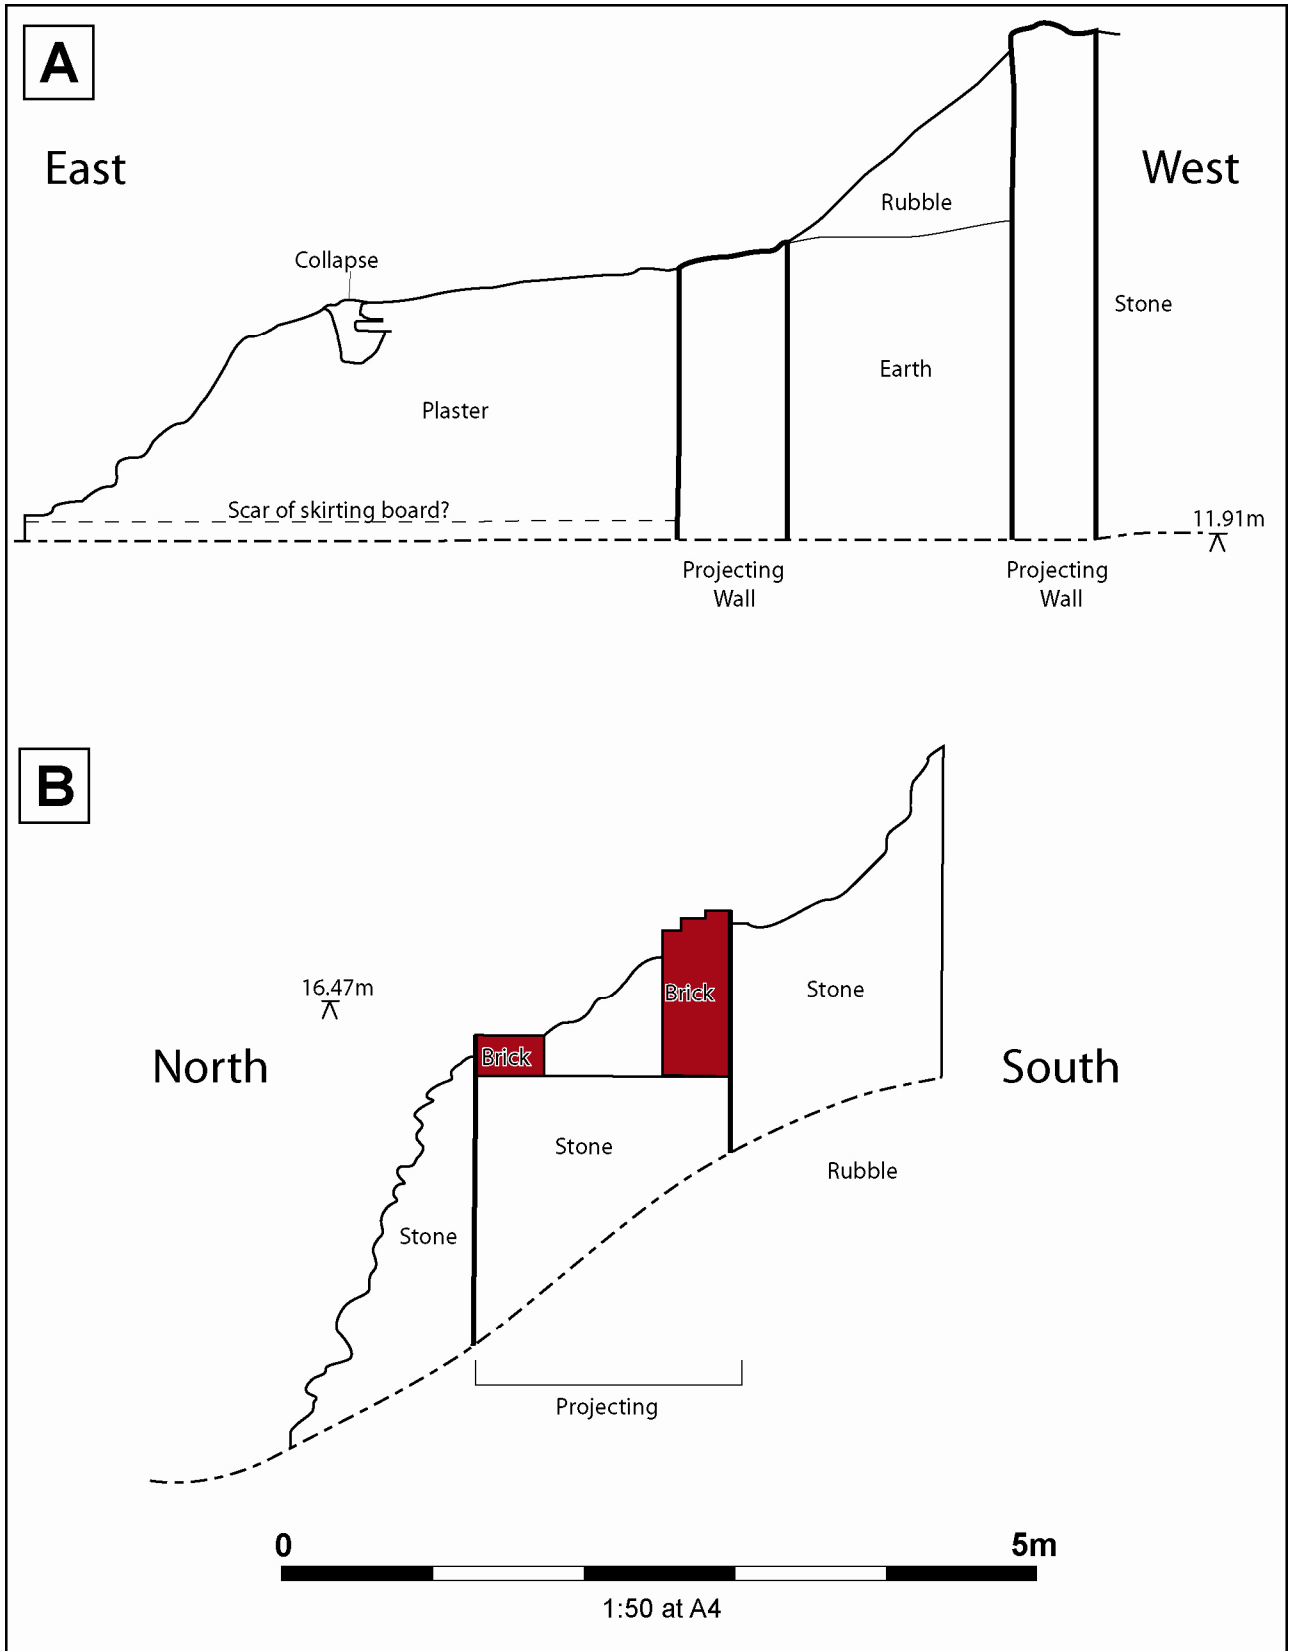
Elevation 2 viewed from the north-east (A) and Elevation 3 viewed from the south-west (B).
